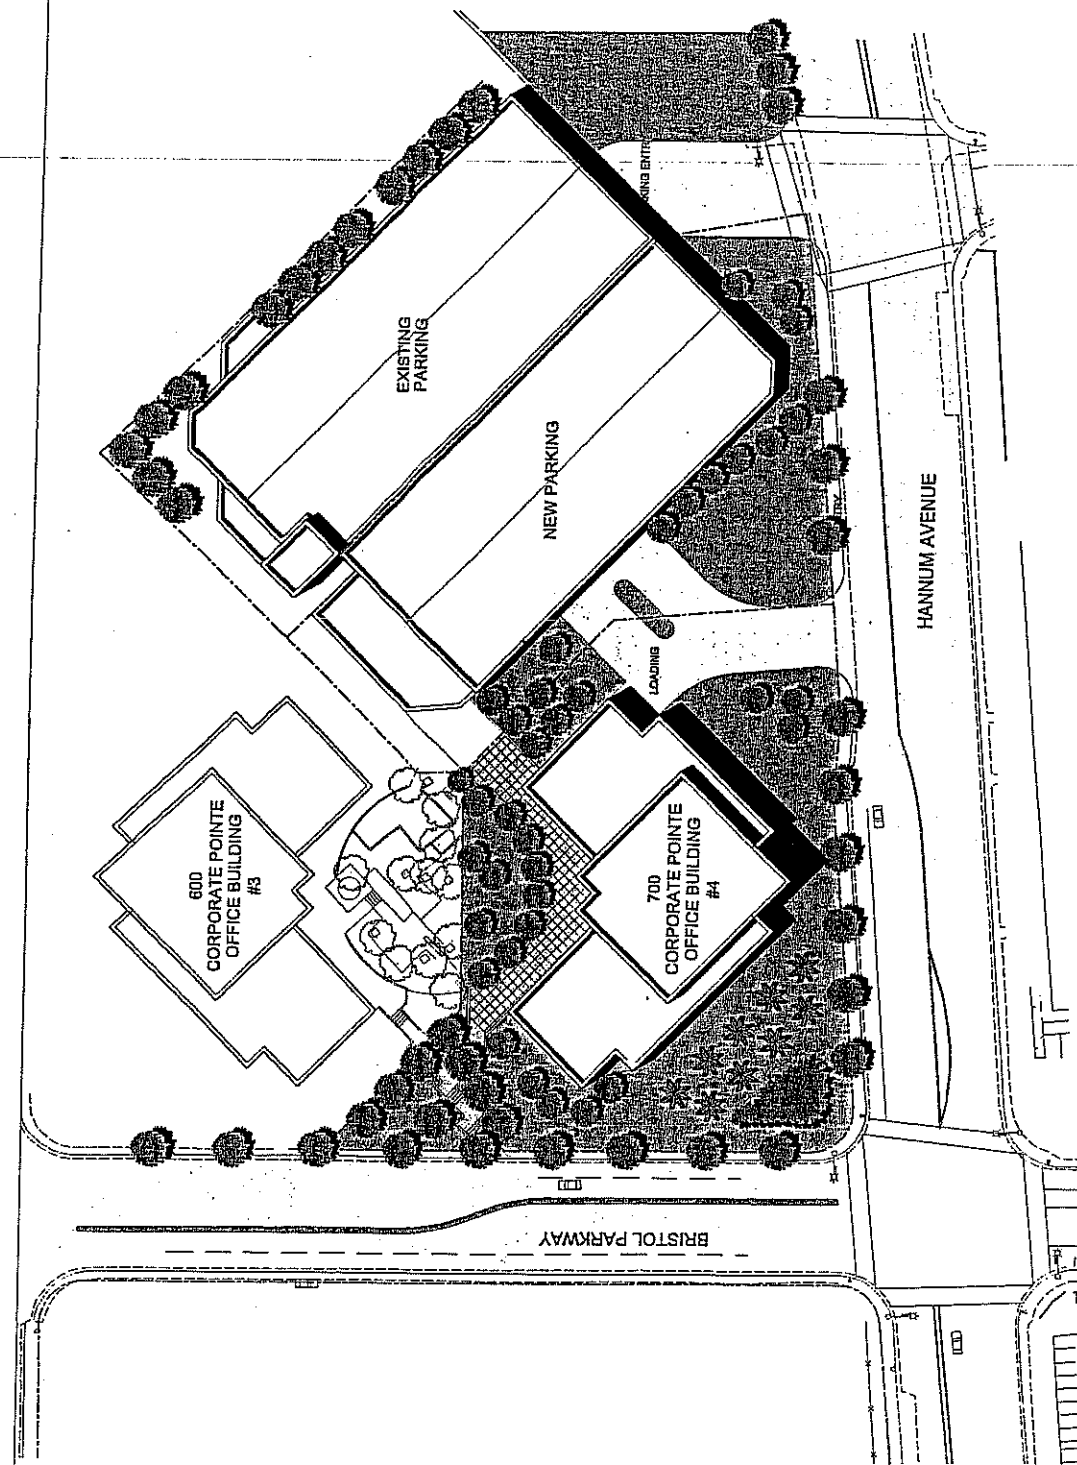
EXHIBIT A - SITE PLAN REVIEW/SPR NO. 87-09
